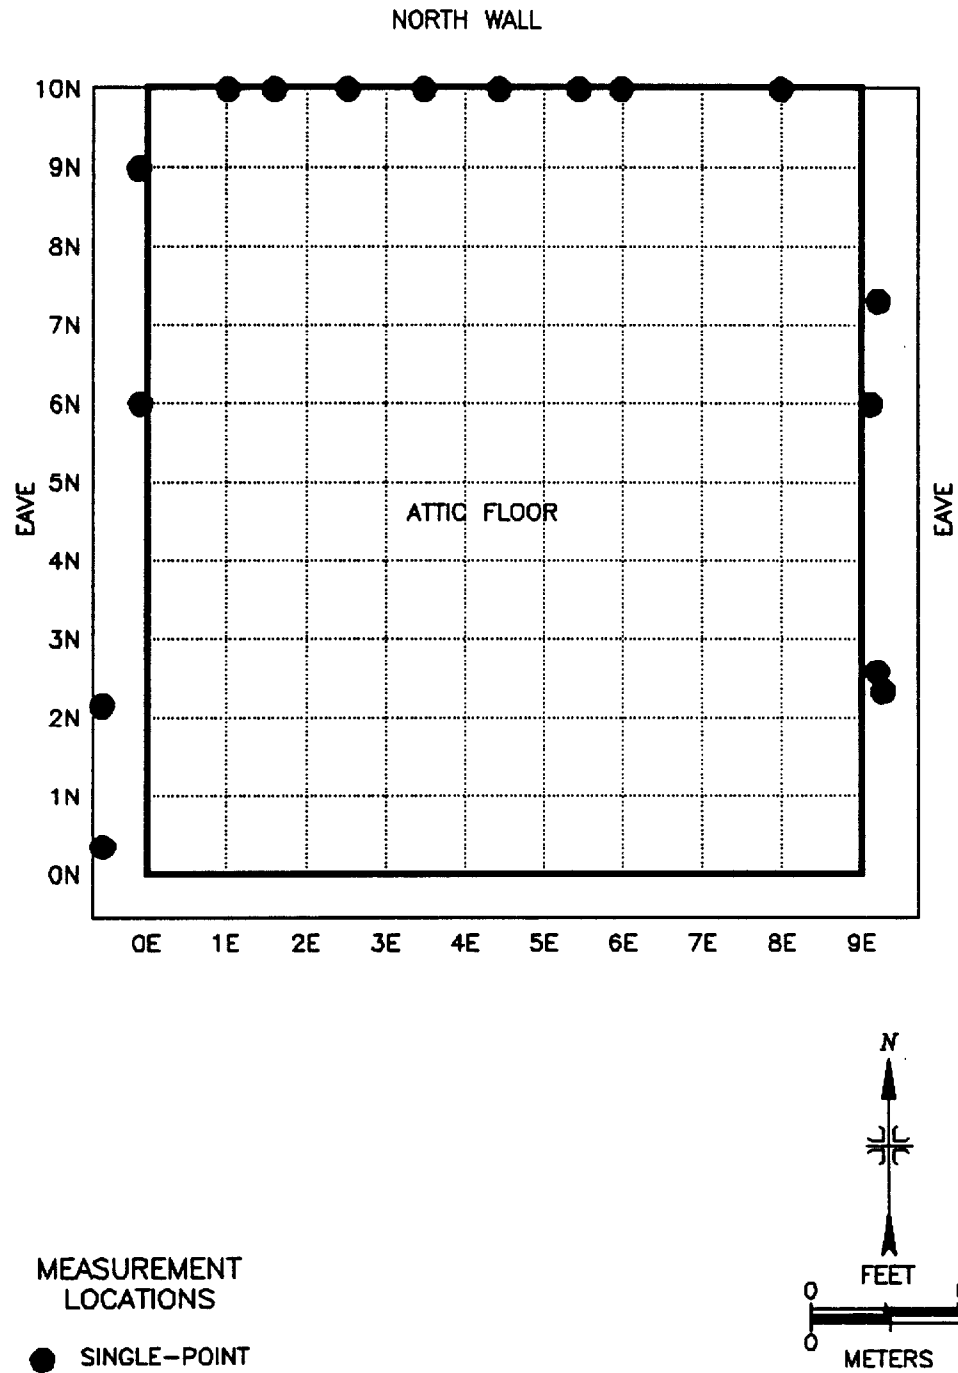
Building 31, Eaves of Attic Above Room 1 and Top of North Wall – Measurement Locations
